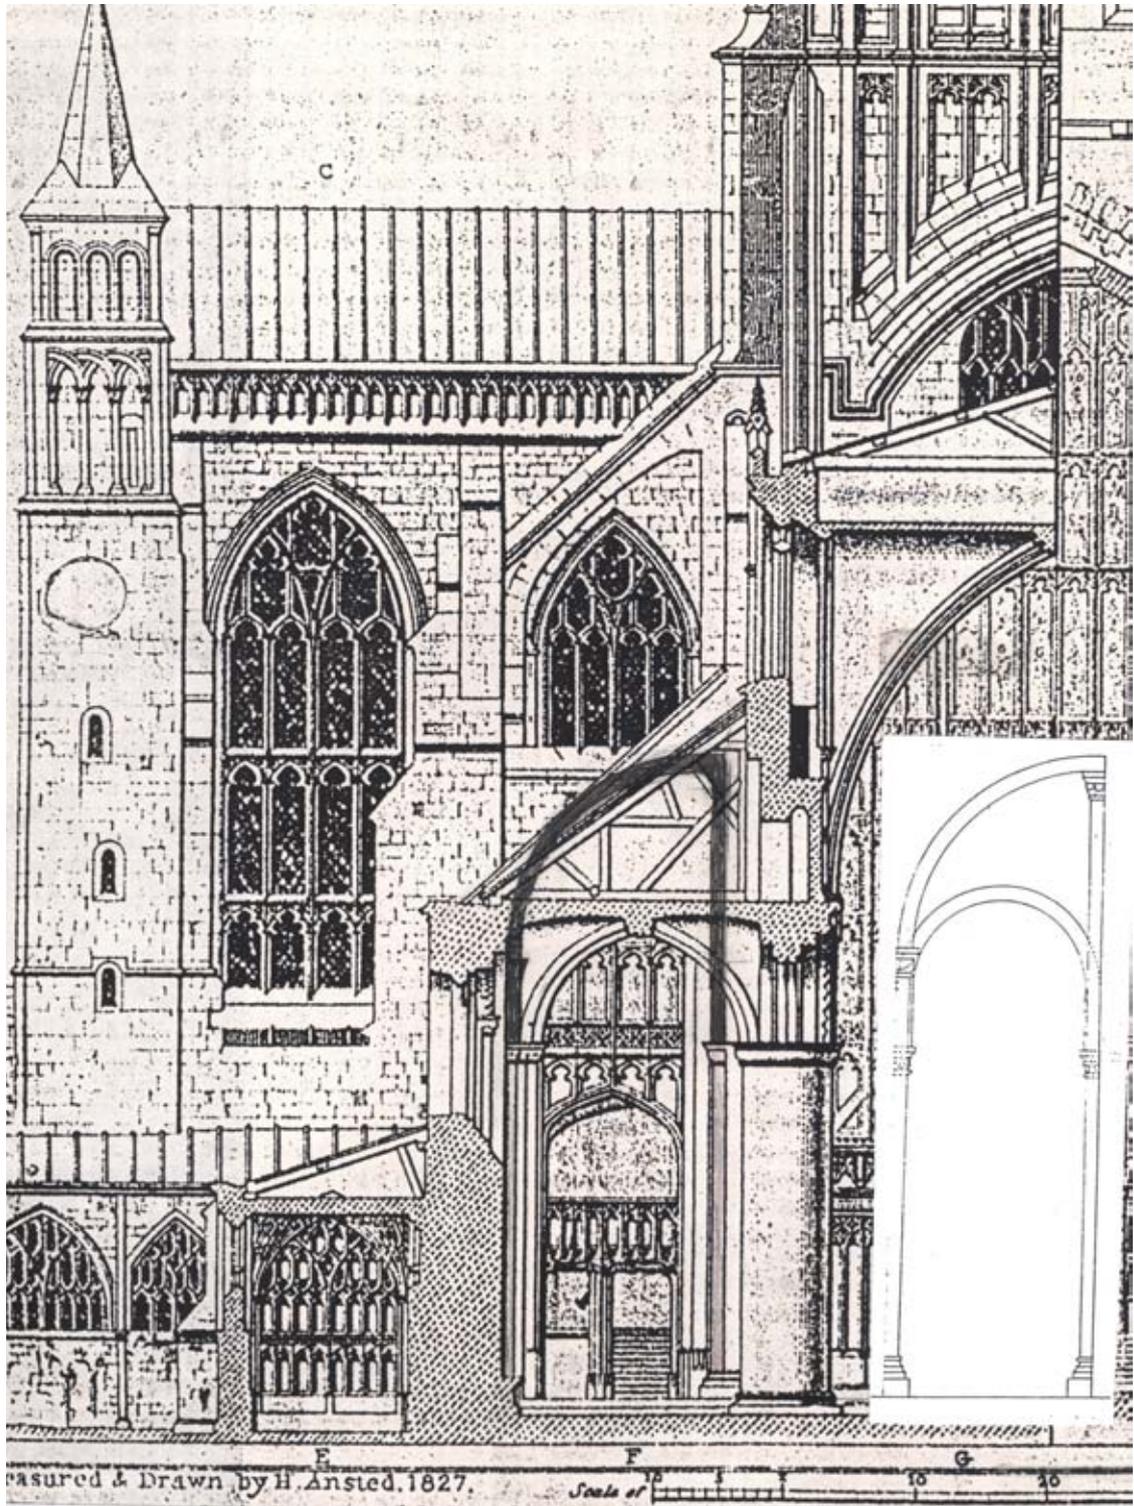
Copy of Ansted's elevation /cross section of the north aisle and north transept, from Britten 1829. Inset: Wilson's reconstruction of the phase 1 north aisle at about the same scale.
